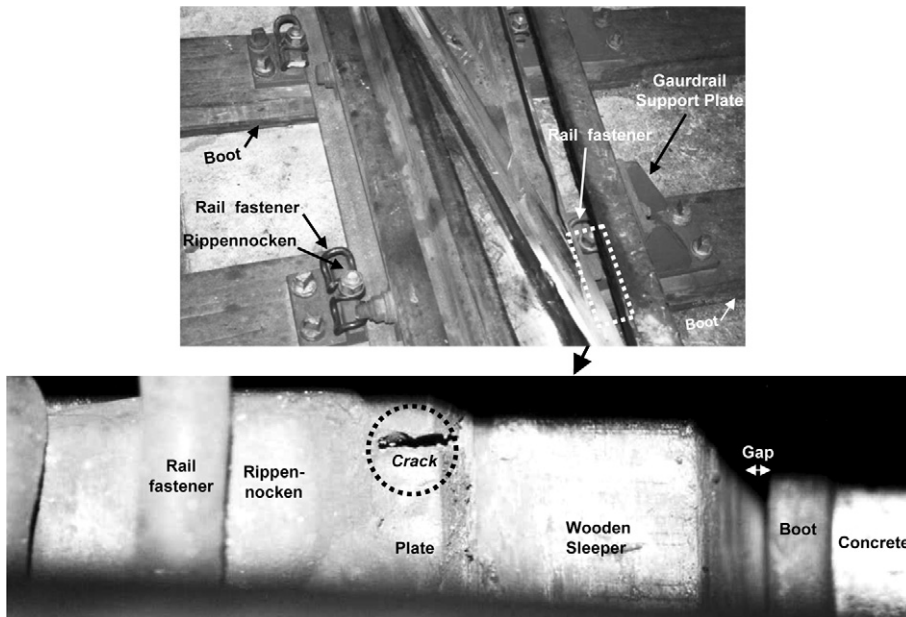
Initiation of a crack in a guardrail support plate near the area of crossing. Notice the gap between the wooden sleeper and the rubber boot.
